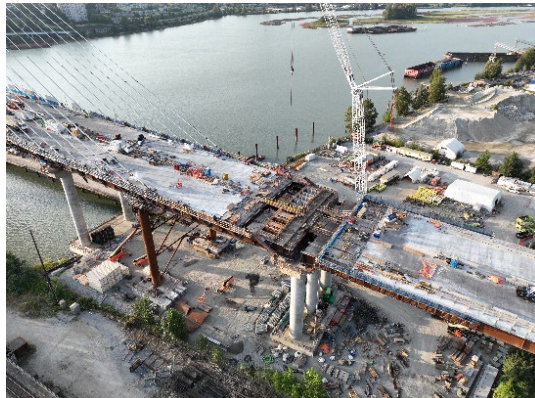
Crews completed installation of concrete deck panels on the end span and the bridge finishing activities are underway on the south approach.
